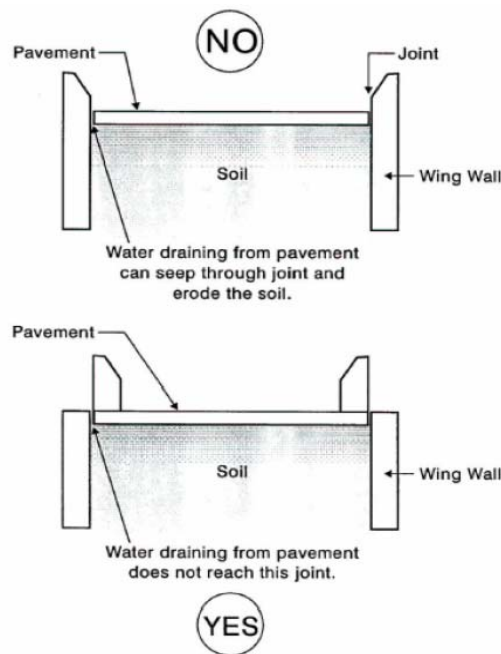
Cross Section of a Wingwall and Drainage System (Briaud et al., 1997)
